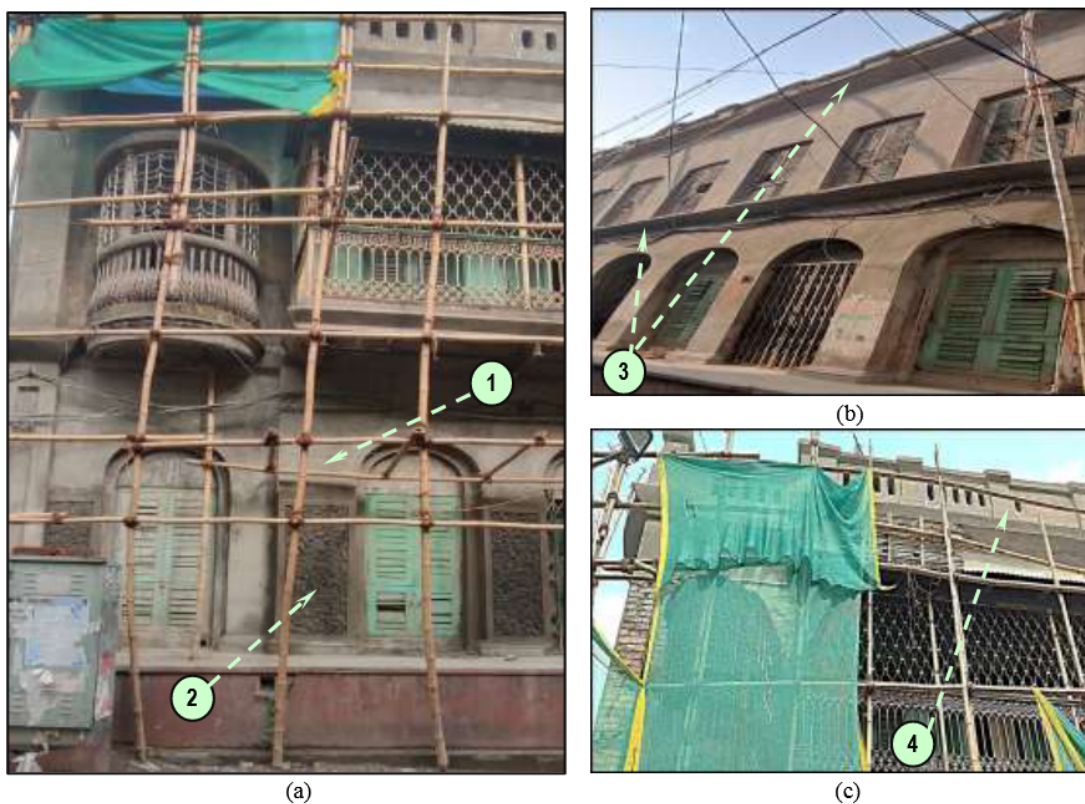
Plastered exterior walls: (a) Front view, (b) Side view, and (c) Front parapet wall
